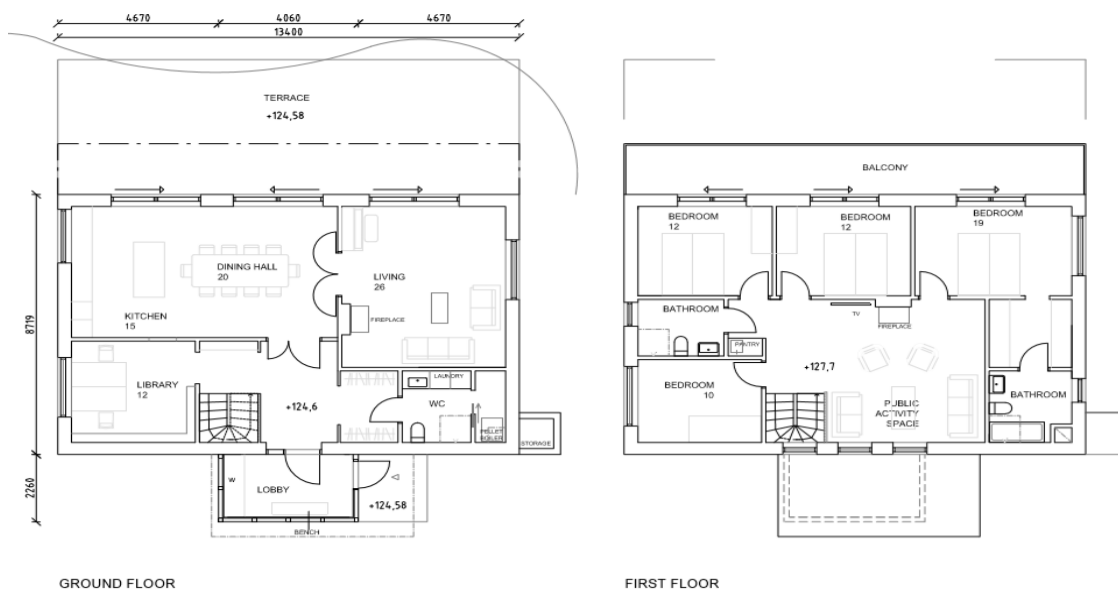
Building's ground floor and first floor overview, all units are in mm, reproduced with permission by Tina Eik architecture
